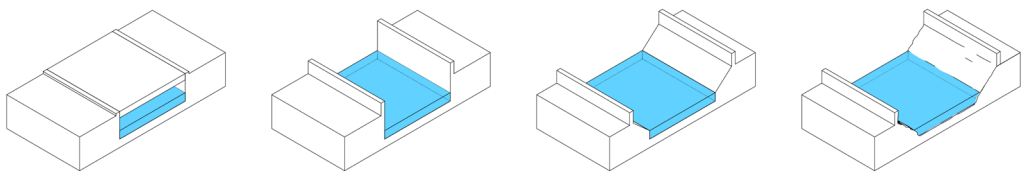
Deculvertisation: From Simple Removal of Overhead Structures to Regrading Banks and Profiling Channels. (Author's elaboration).
